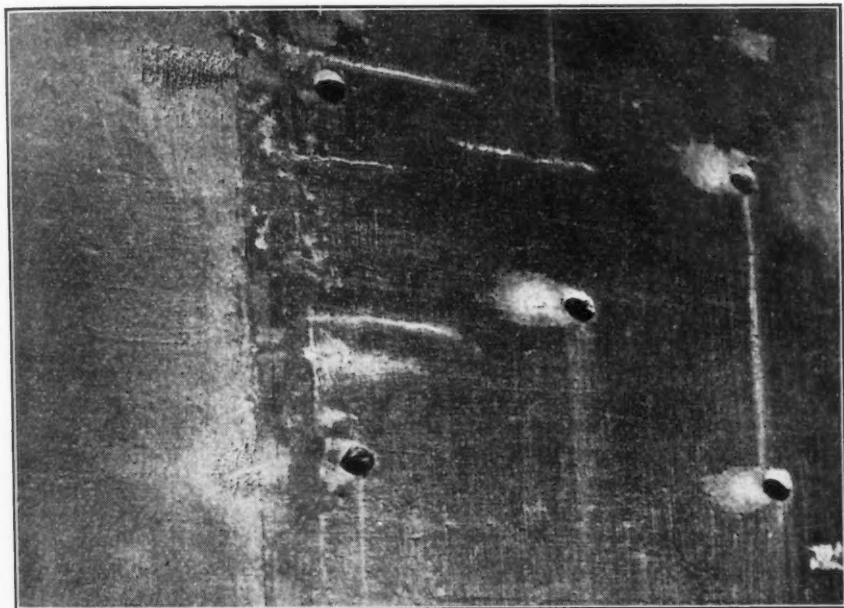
CAVITATION PITTING BELOW WEEP HOLES IN NORRIS SLUICE CONDUIT LINER
